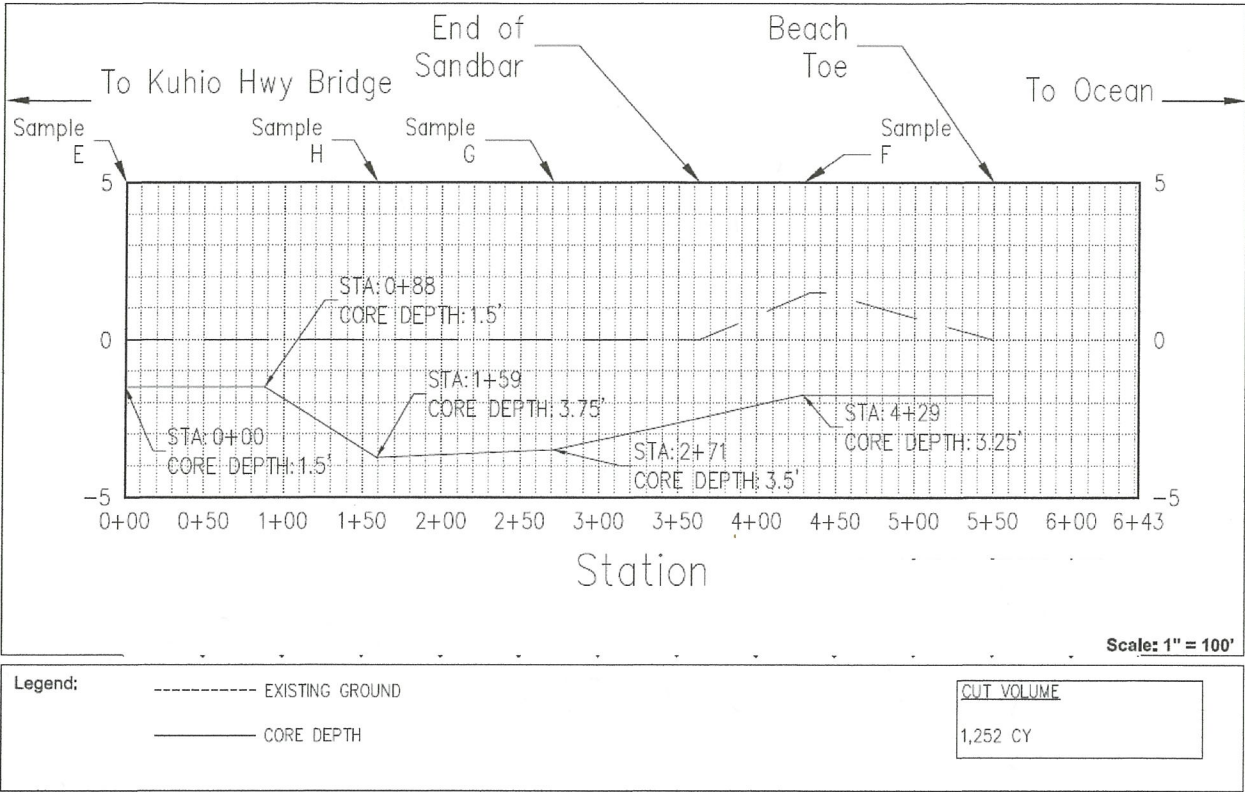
Waipouli Drainage Canal Sediment Sampling Profile View
